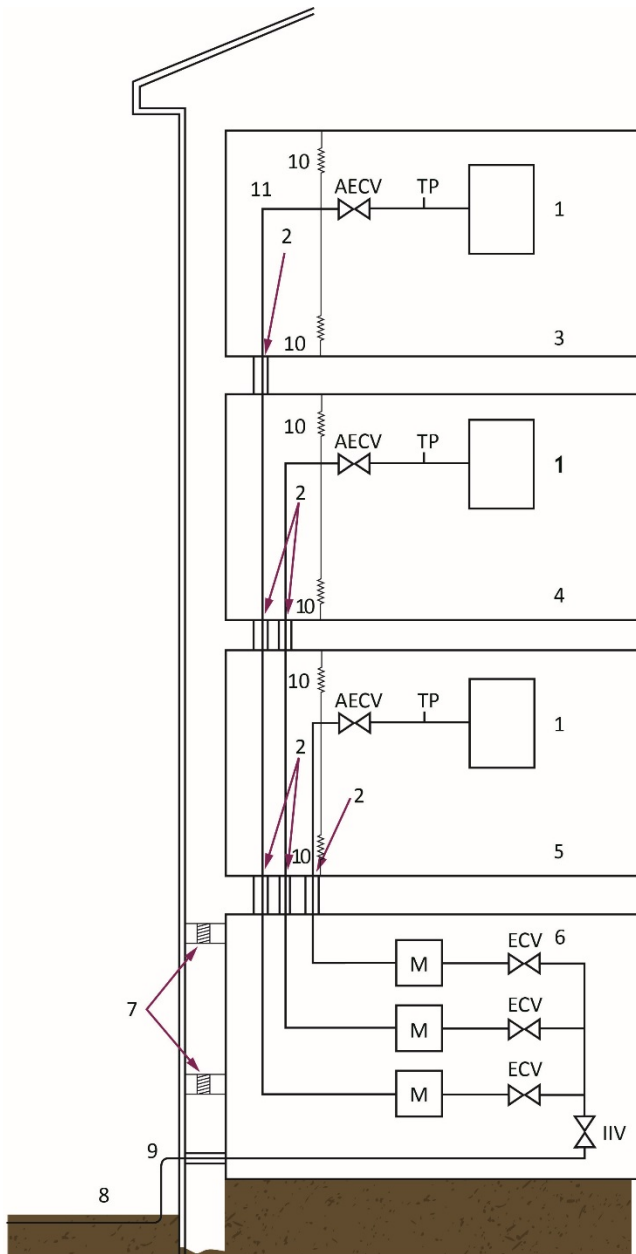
Typical installation pipework in multi-storey buildings containing flats or maisonettes (Ventilated Duct)
